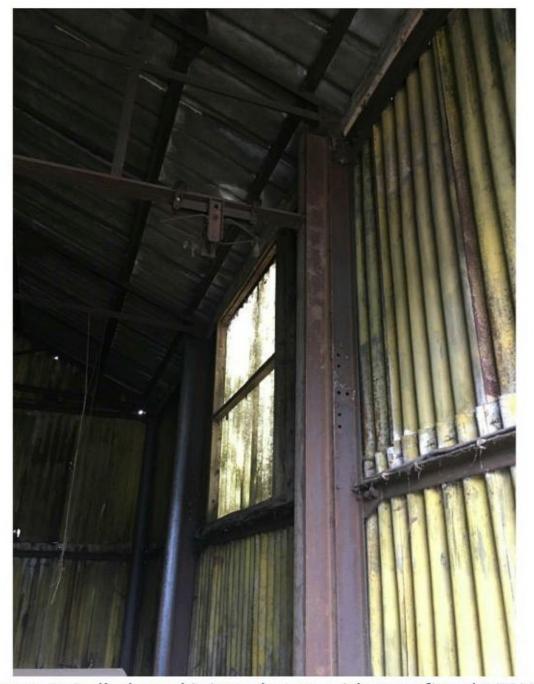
Rolled steel joist columns with retrofitted 152UBs.
